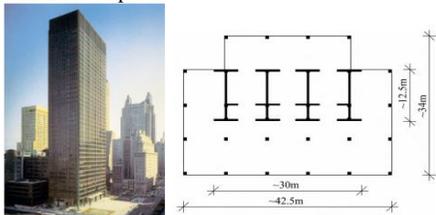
Seagram Building, New York, USA, 1958 (photo courtesy of Antony Wood / CTBUH)
